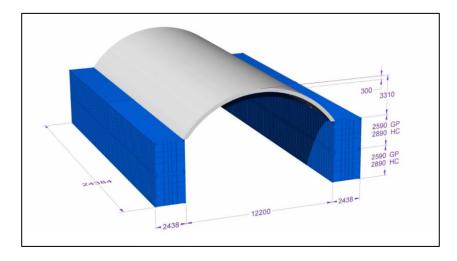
HV Workshop Structure (Single Double Stacked Arrangement Shown)
